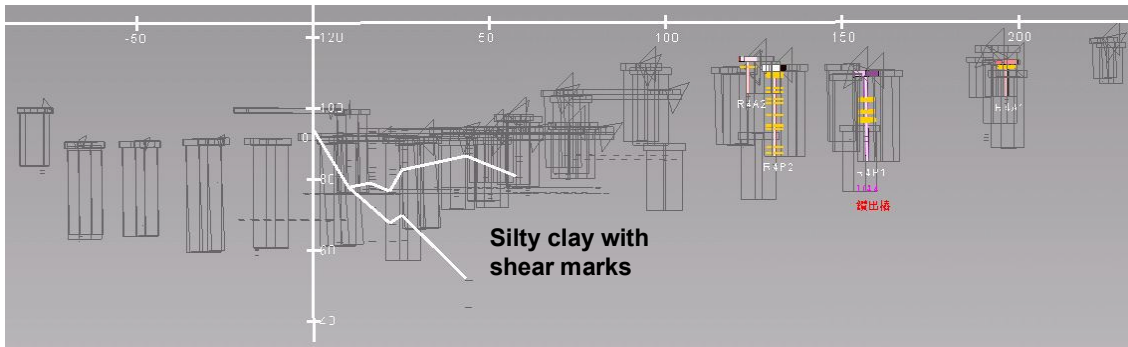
Location of cracks in cores from piles for the Ramp #4 viaduct piers and abutments looking from south to north in the direction of along the estimated fault trace: This figure is prepared from the 3D model of Bauweishan, displaying Layers “2D-ramp4 Post EQ”, “captions-ramp4”, “cracks-ramp4”, “scale” and hiding the others. The cracks were rather sparse as contrasted with those in Fig. 2.17 and 2.18.
